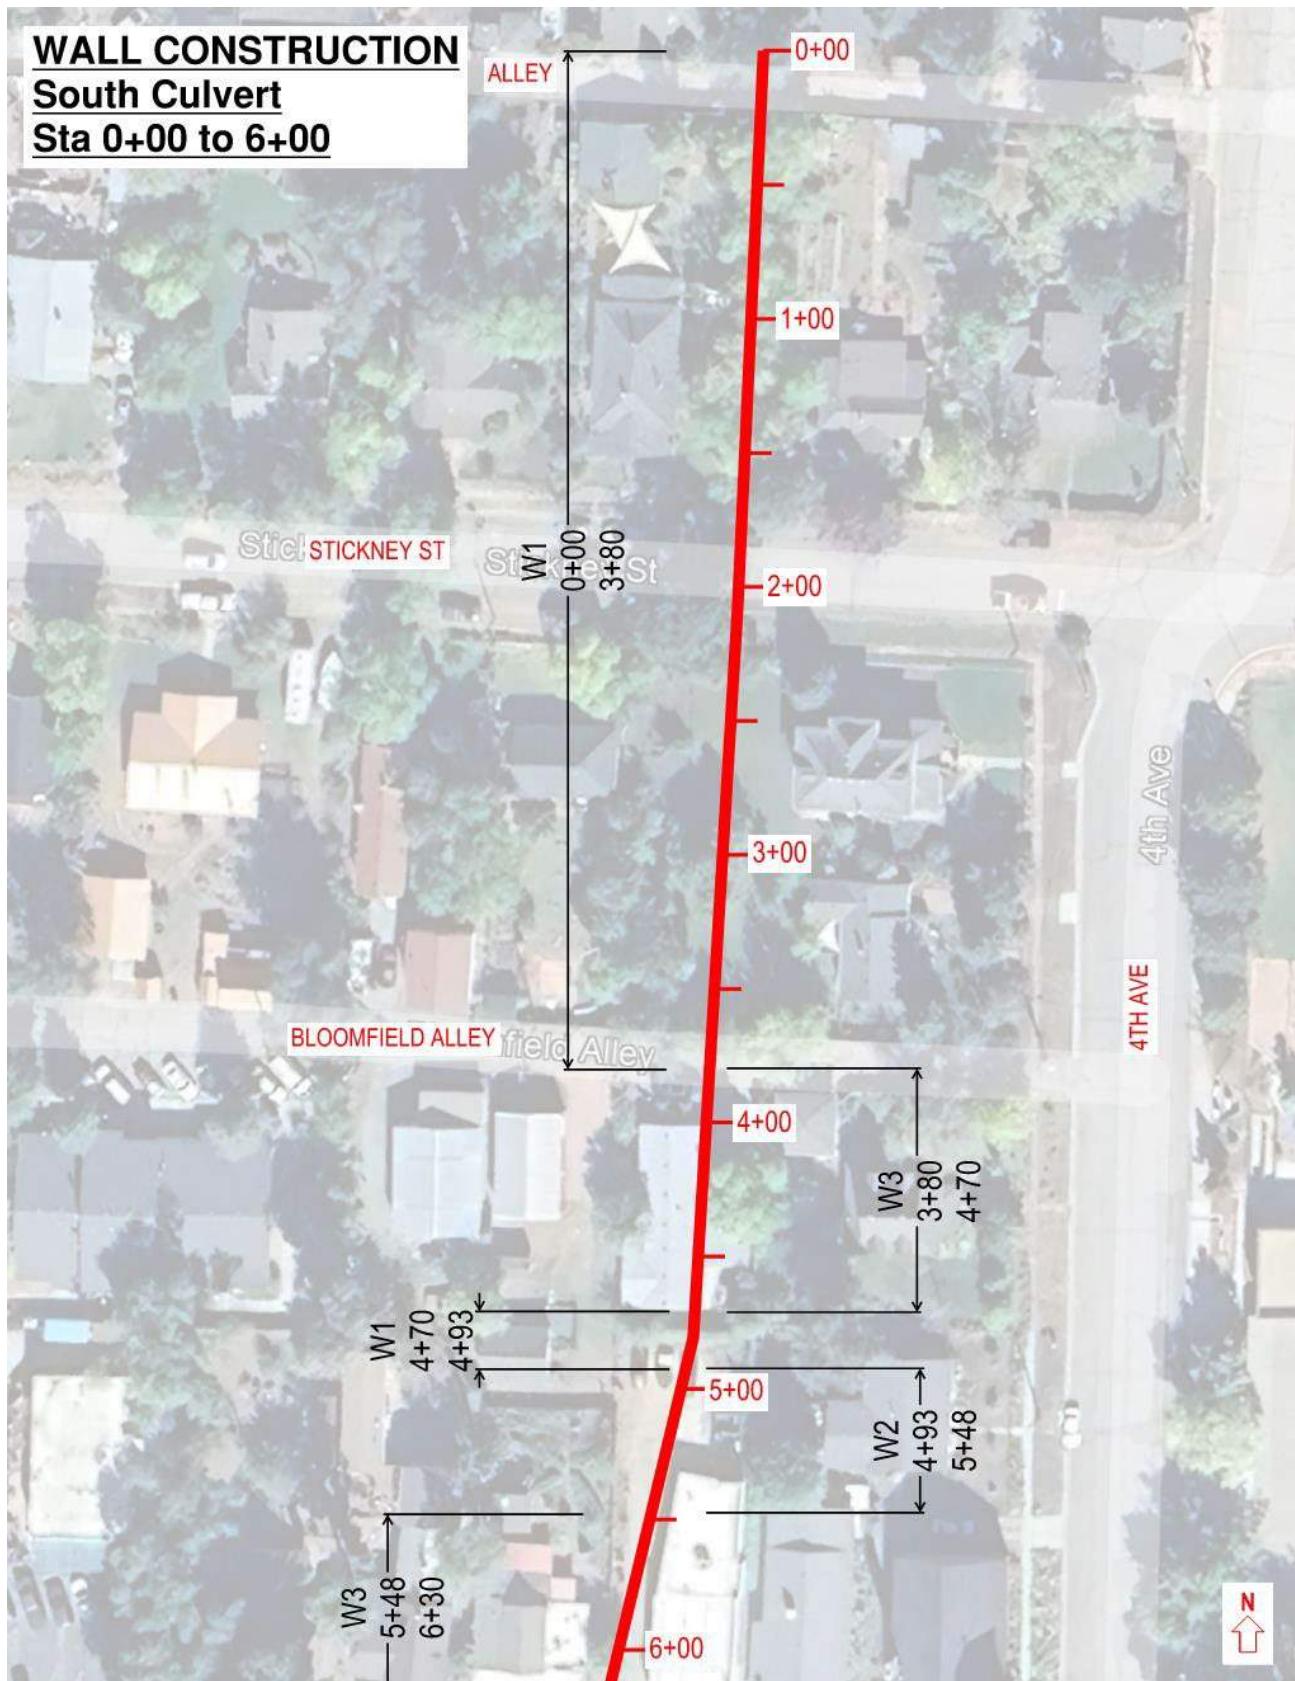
South Culvert Wall Construction Stations (S)0+00 to (S)6+00
